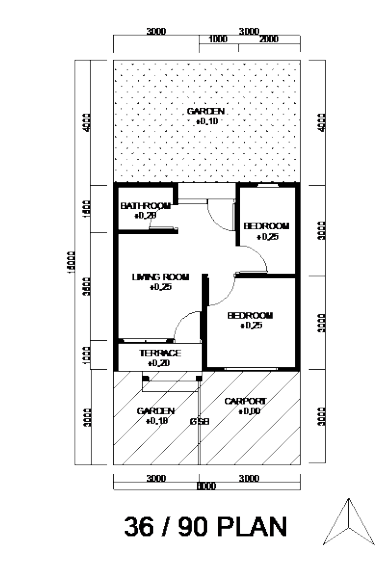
Plan Building area: 36 M², Land area : 90 M²
